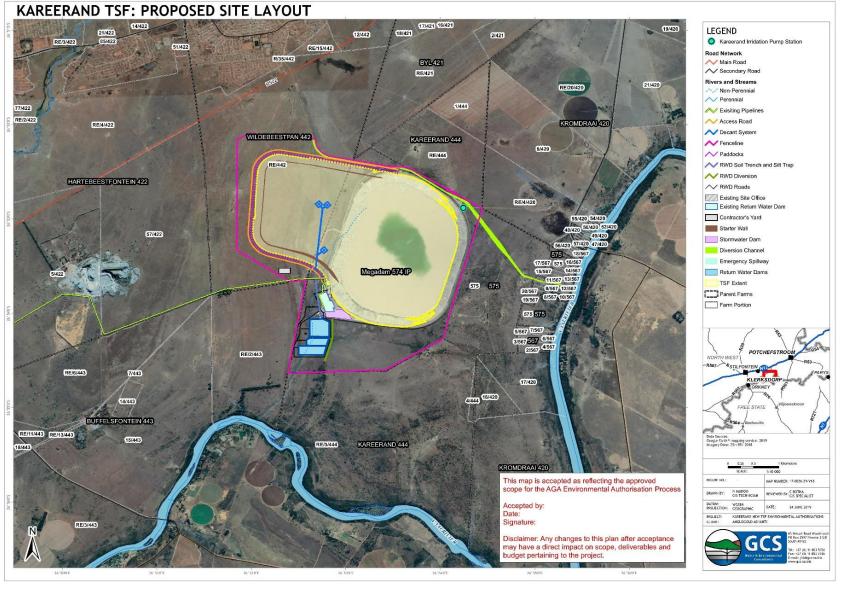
TSF expansion site layout in detail, including associated infrastructure
